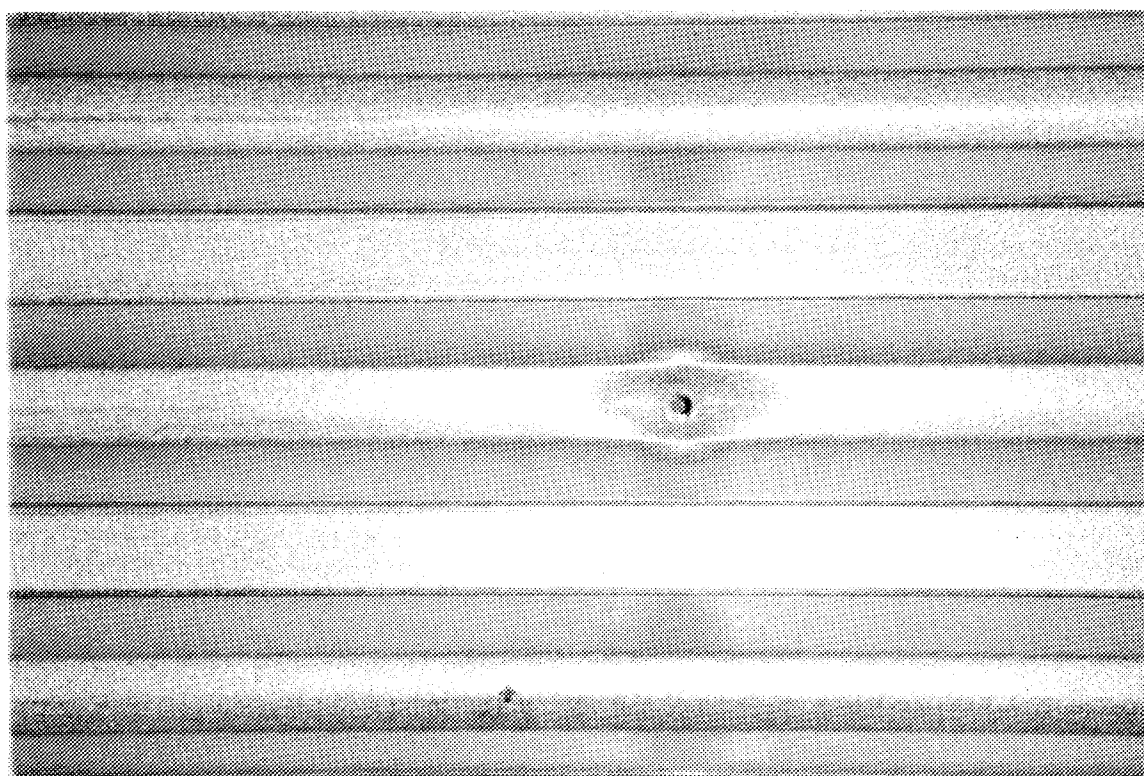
LOCAL PLASTIC DEFORMATION OF TRAPEZOIDAL TYPE ROOFING SHEET
